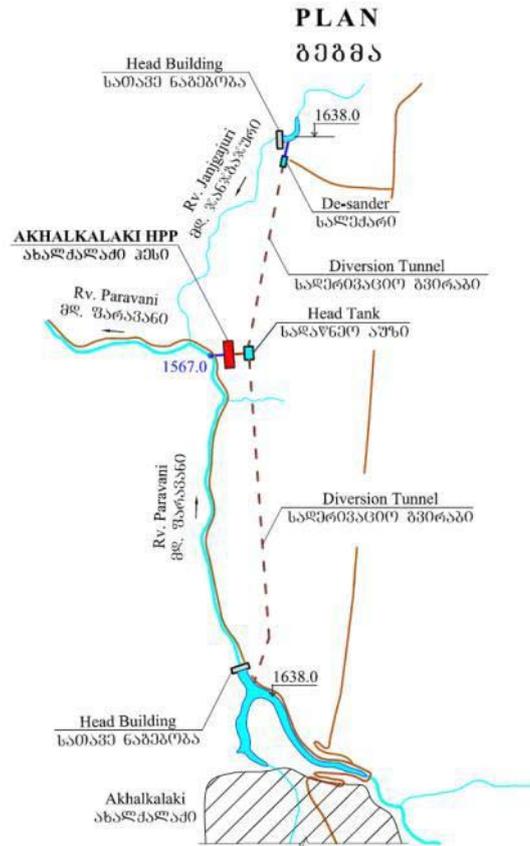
The plan of Akhalkalaki HPP
